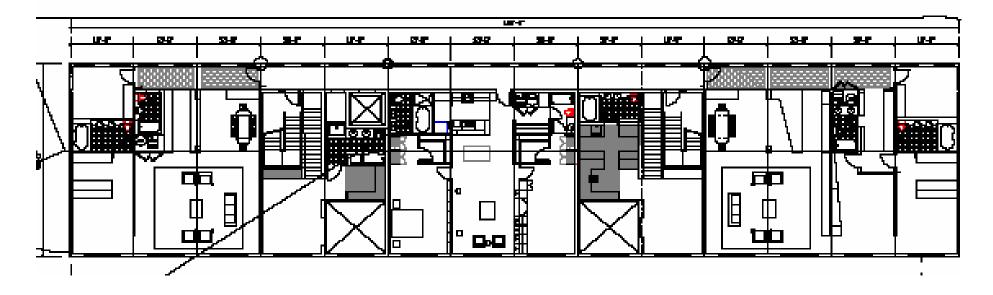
Multi-family mid-rise residential application: plan view of typical condo-level floor (Larson 2004)
